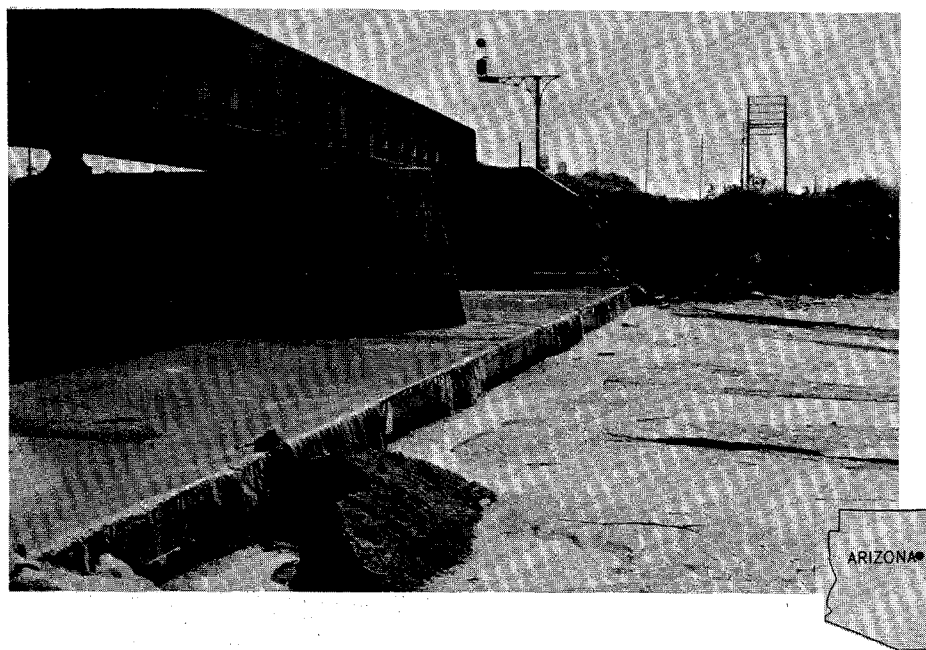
View of concrete cutoff wall built to prevent scour around piers. Note lateral erosion of left bank at the downstream side of abutment.
